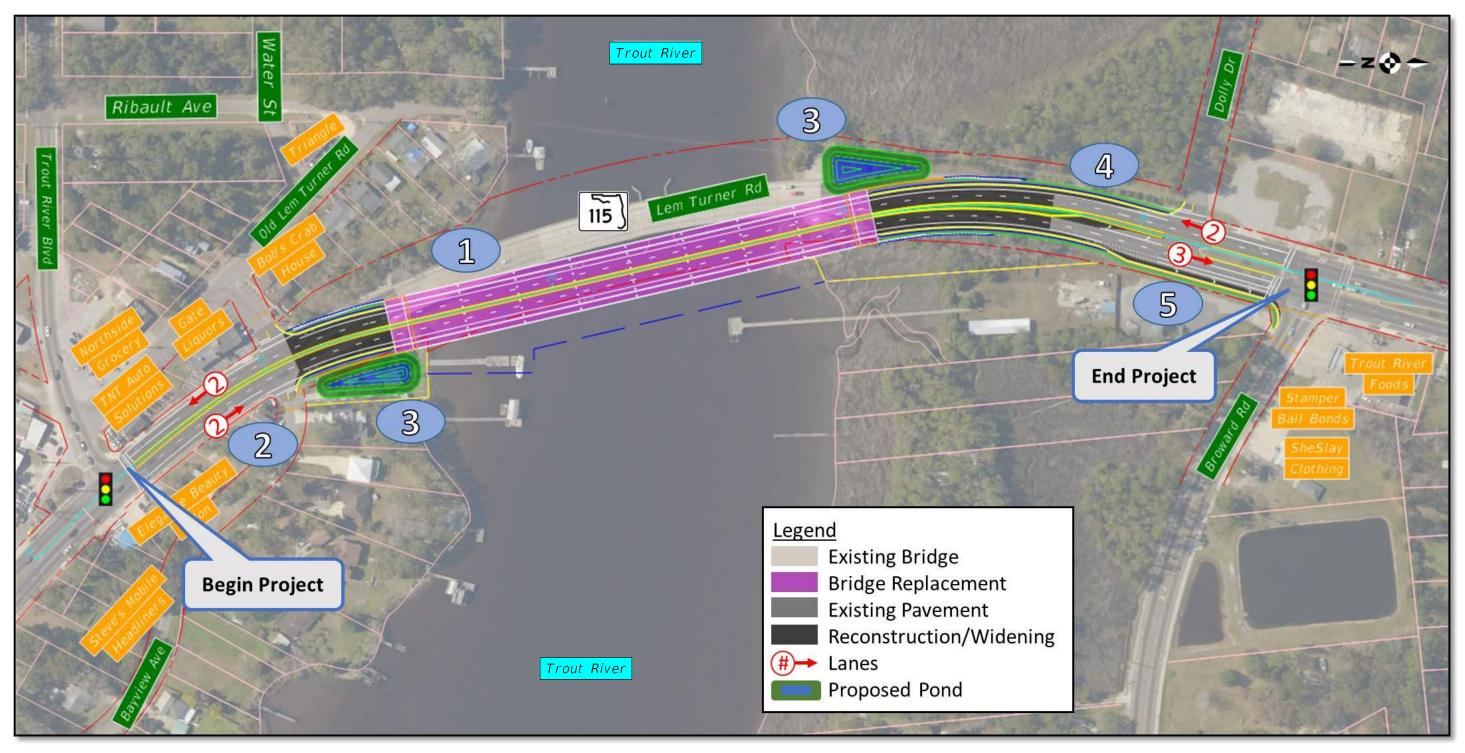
BUILD ALTERNATIVE PROPOSED IMPROVEMENTS
